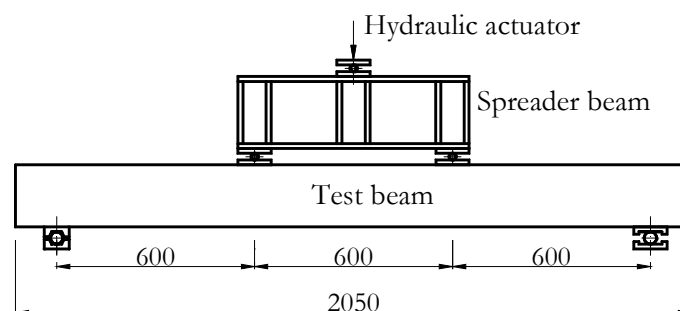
Scheme of the test set-up (dimensions in mm).
